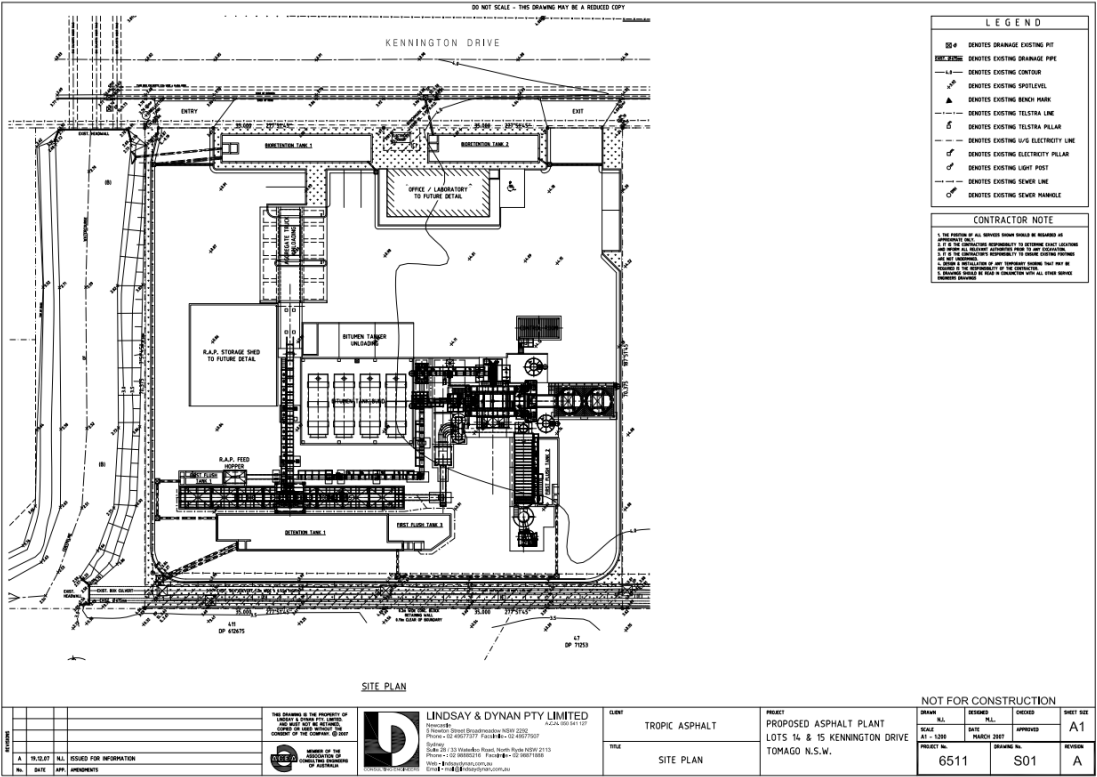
Site Plan (Source: Lindsay Dynan - Not Final Construction Plan)
